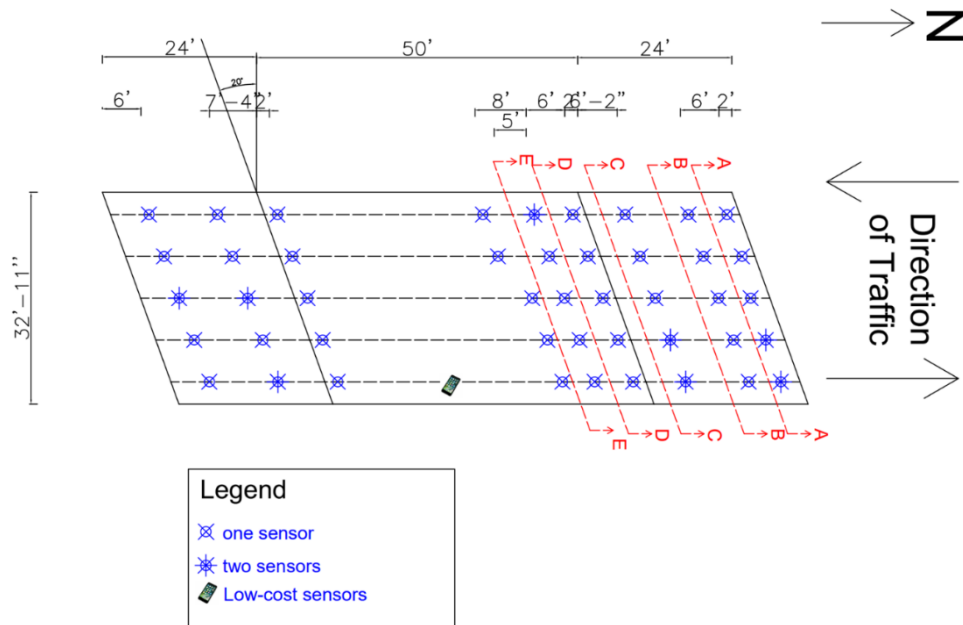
Plan view and sensor locations, Fairbury Bridge.
